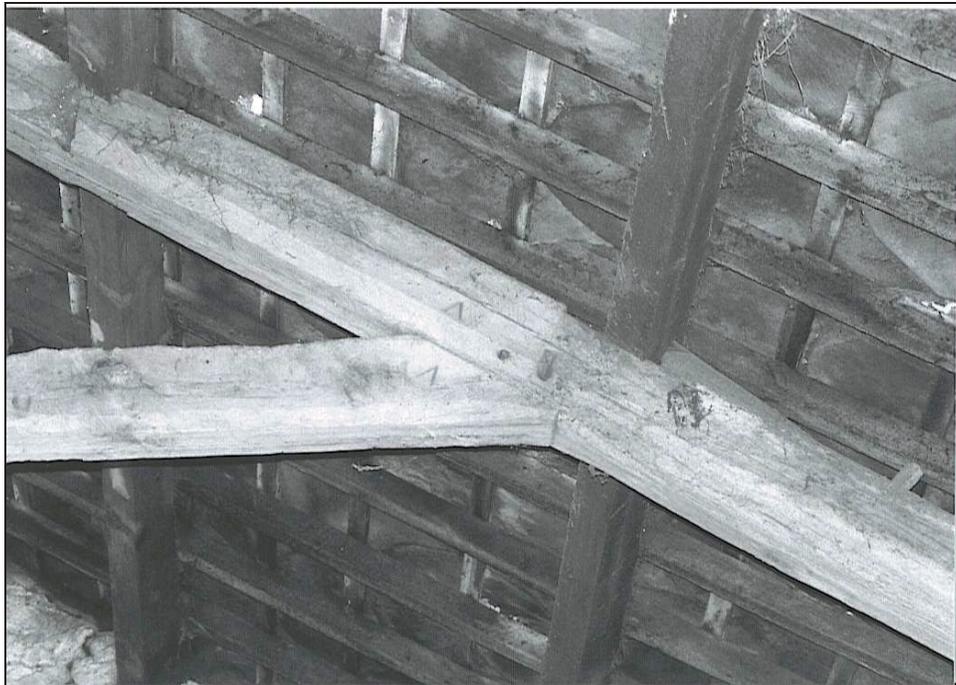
Carpenter's Marks ('V') at western end of collar and on principal rafter, Truss 3, facing south
